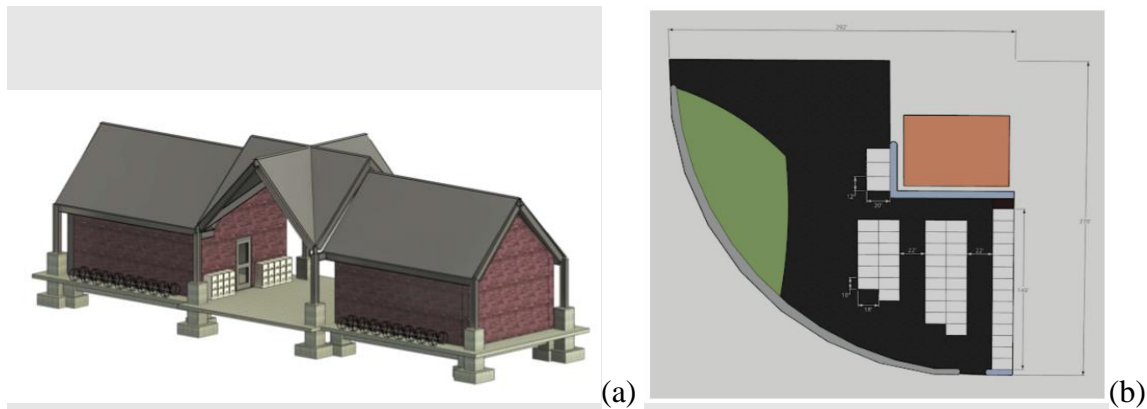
(a) Buff Trails 3D view of the sanitation building (b) Layout of the parking lots
